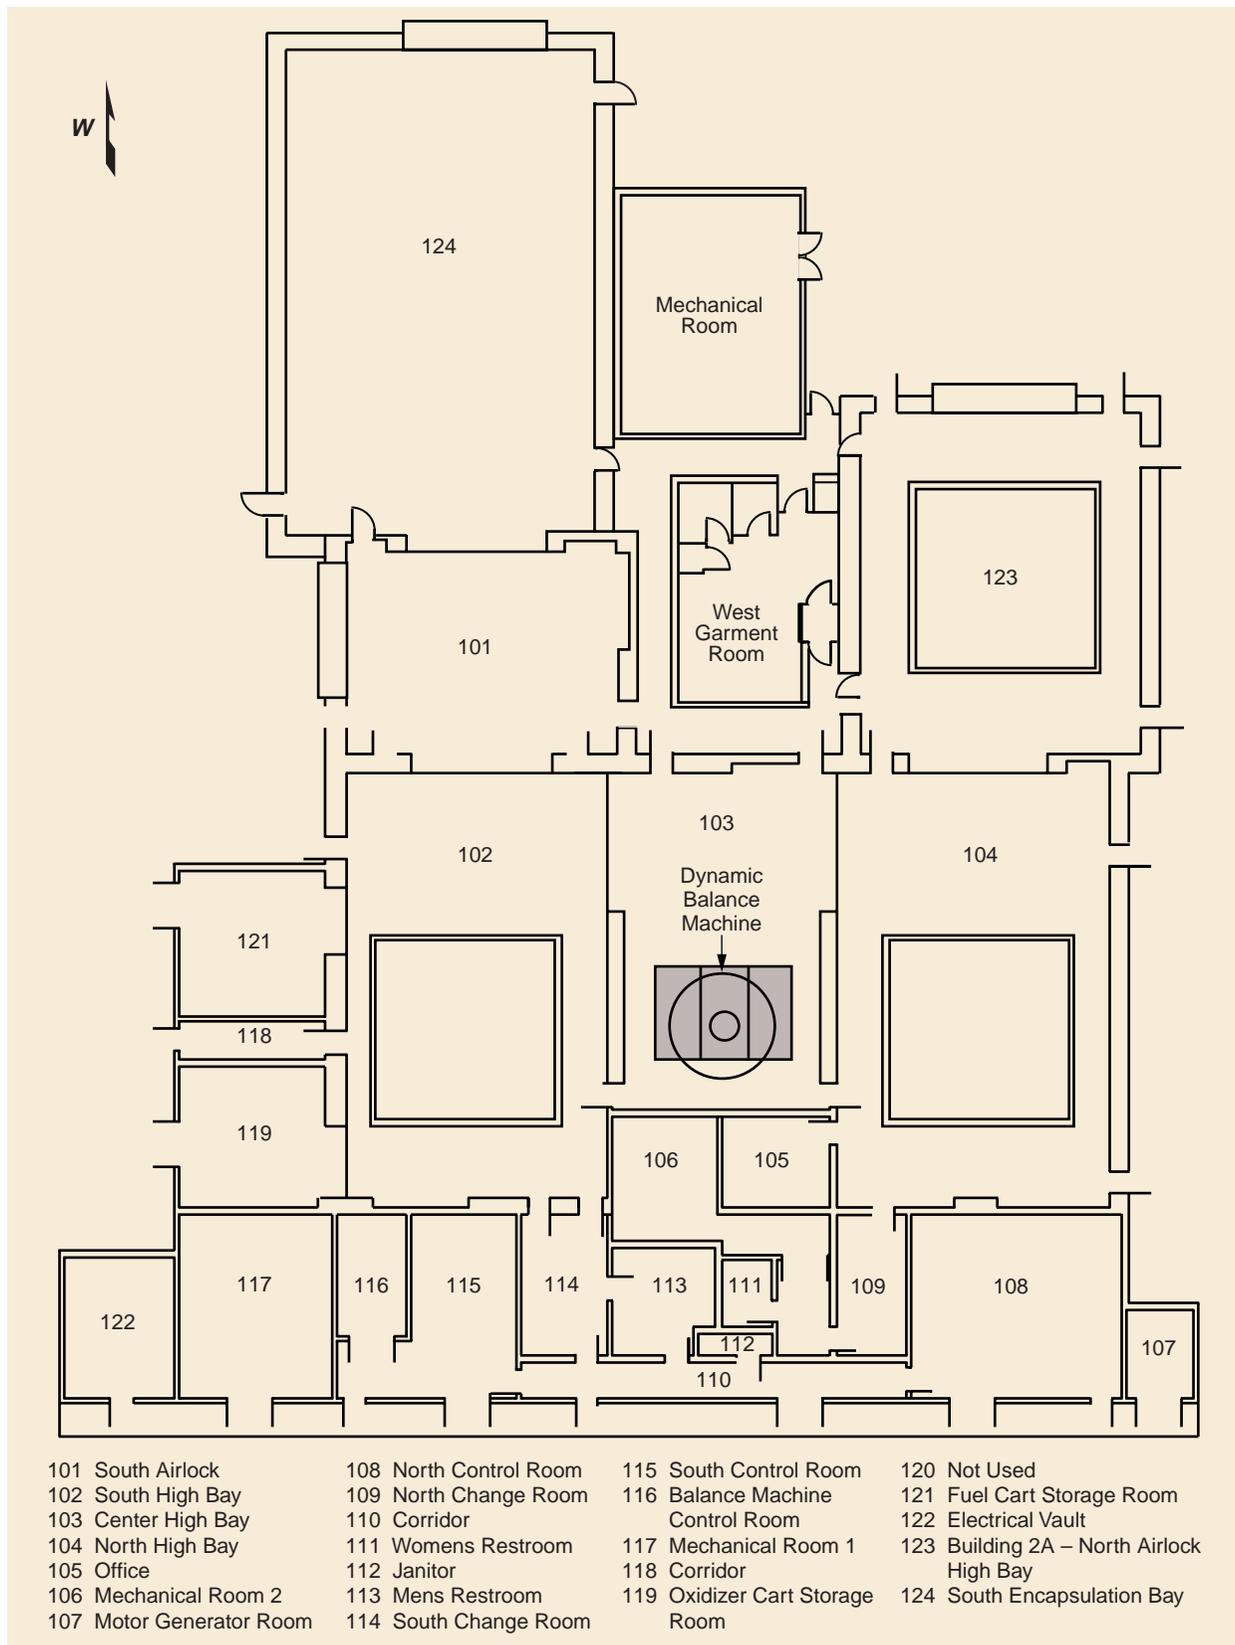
Building 2 (HPF) Detailed Floor Plan, Astrotech
